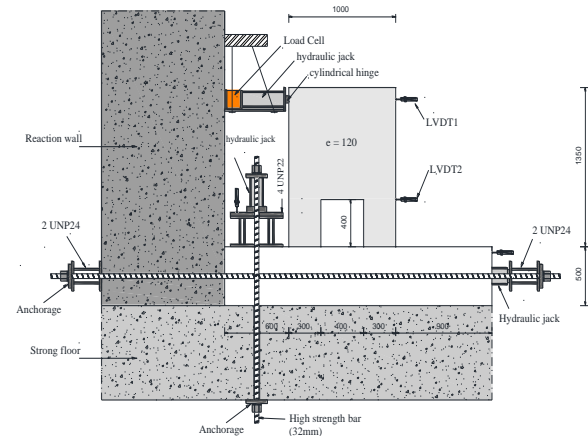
Geometry of the specimen and test setup (dimensions in mm)
